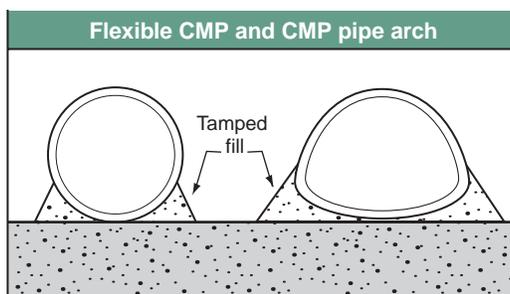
Installing tamped fill beneath the haunches of any shape or type of pipe helps it withstand the soil and traffic loads.
